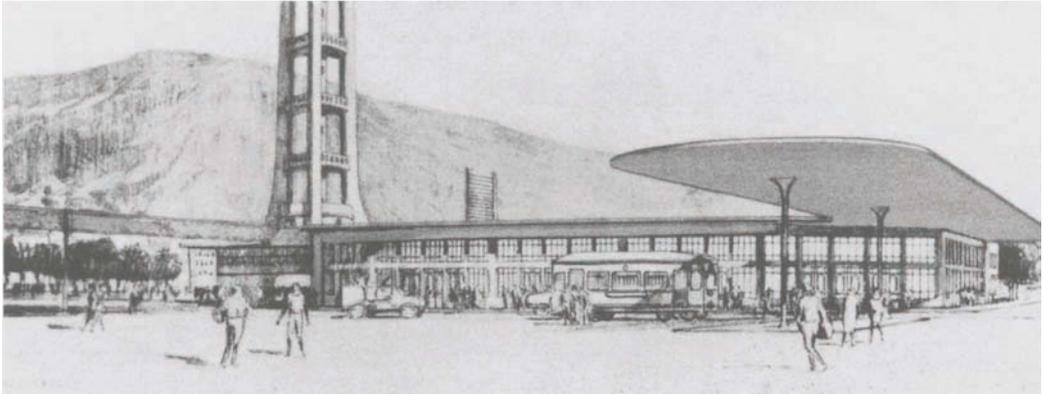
TONY GARNIER: Design for the Underground SUBURBAN RAILROAD STATION of the CITÉ INDUSTRIELLE 1904
